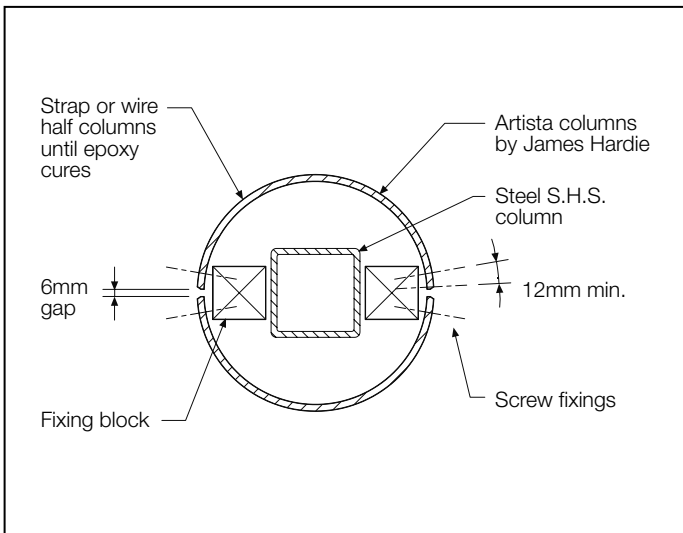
JOINING SPLIT COLUMN AROUND AN INTERNAL POST
